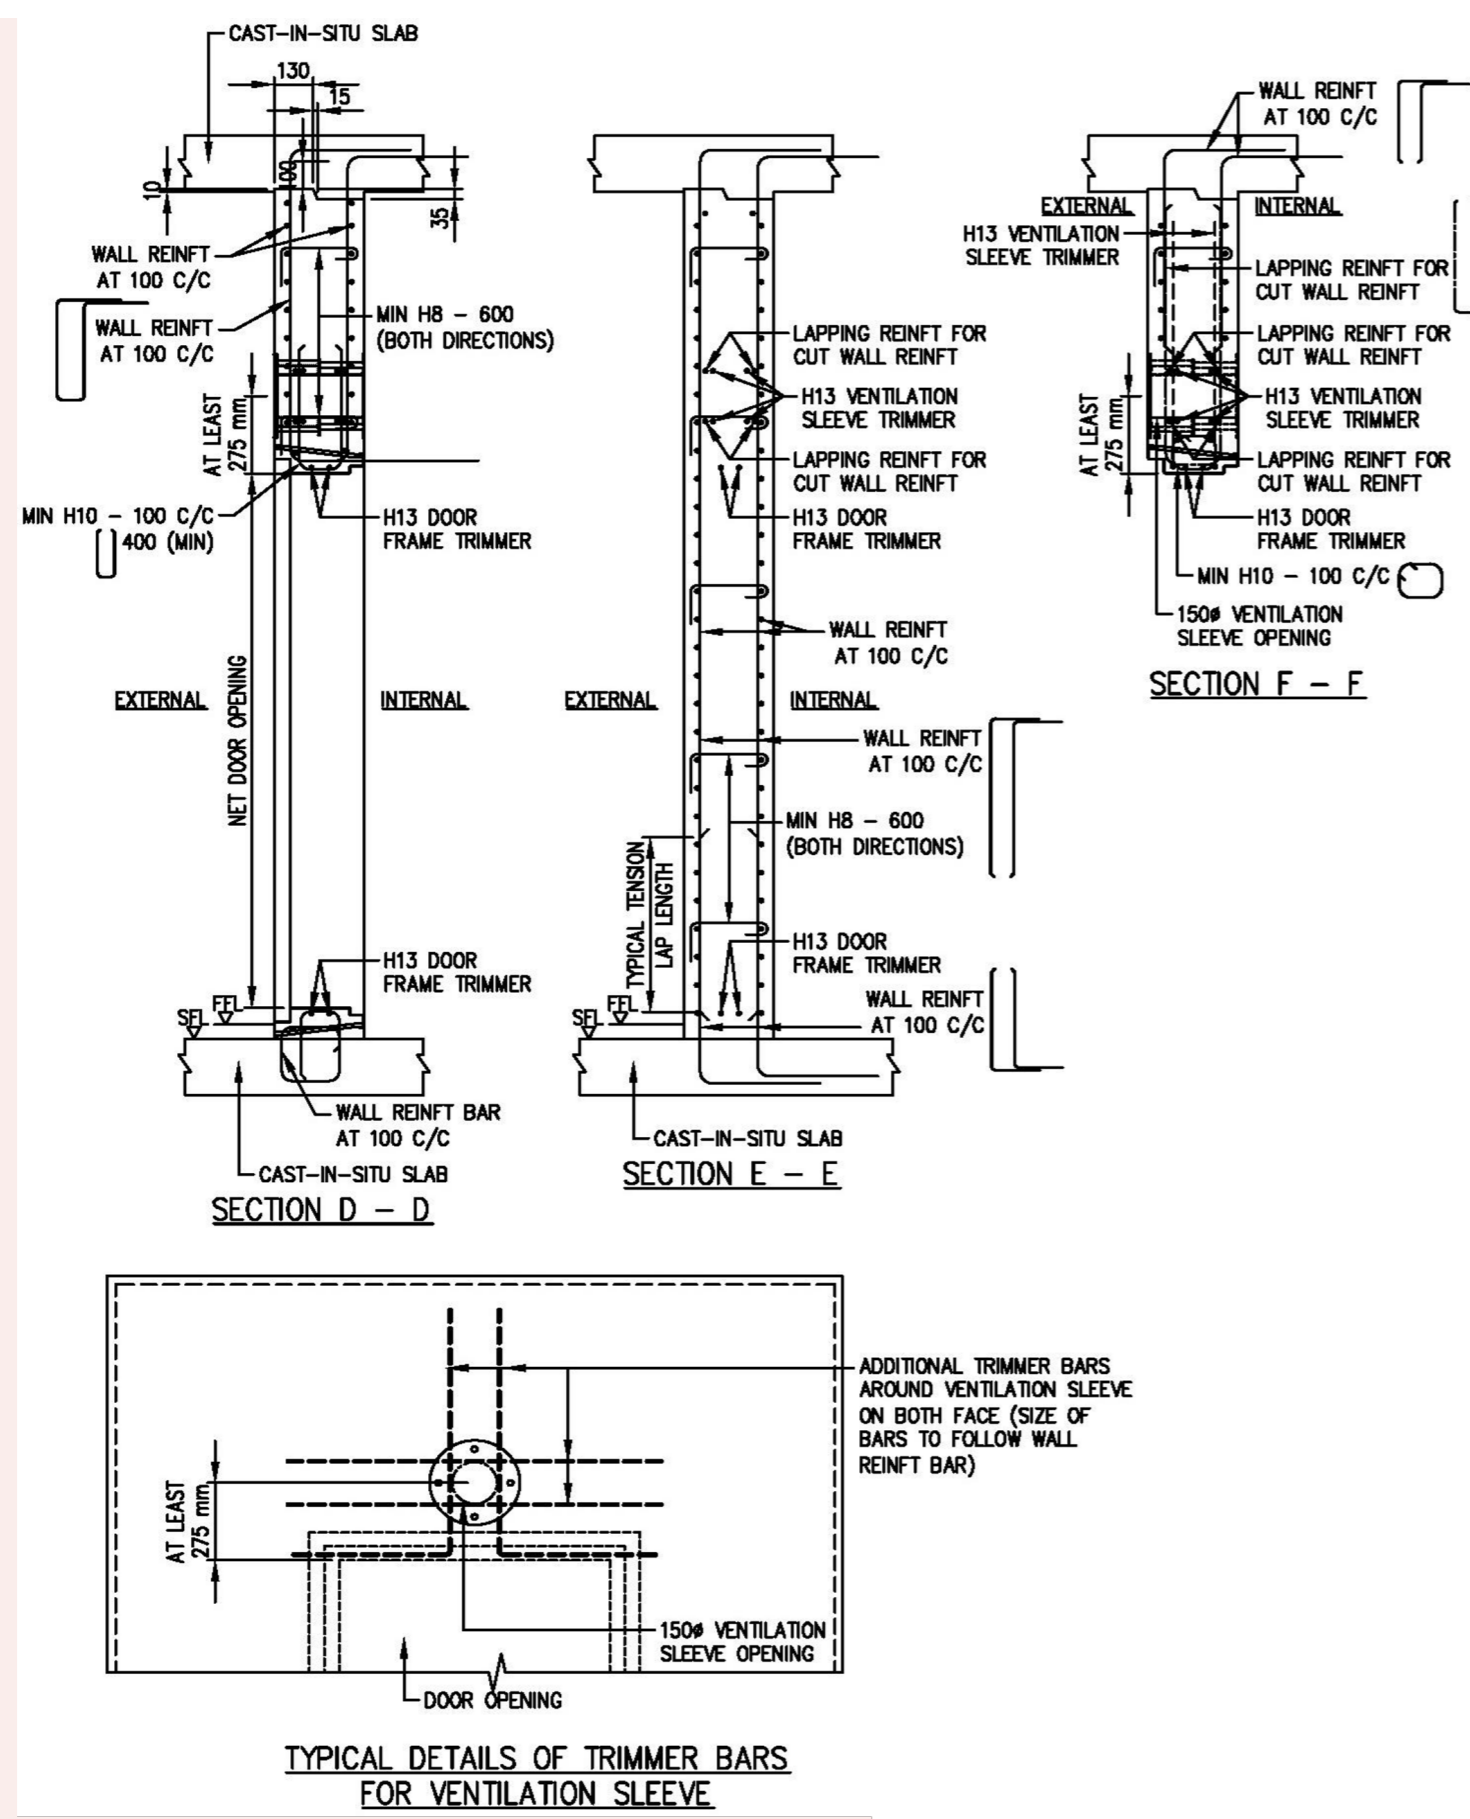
(o)(i): TYPICAL DETAILS AND SECTIONS OF REINFORCEMENTS AT VENTILATION SLEEVE LOCATION
